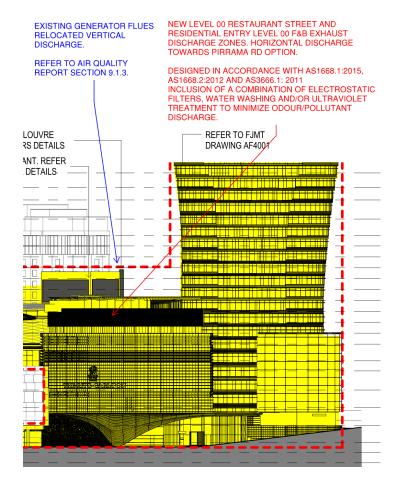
Level 06 Elevation view - Residential Entrance Level Restaurant (Level 00) and New Restaurant Street Level 00 exhaust discharge location.
